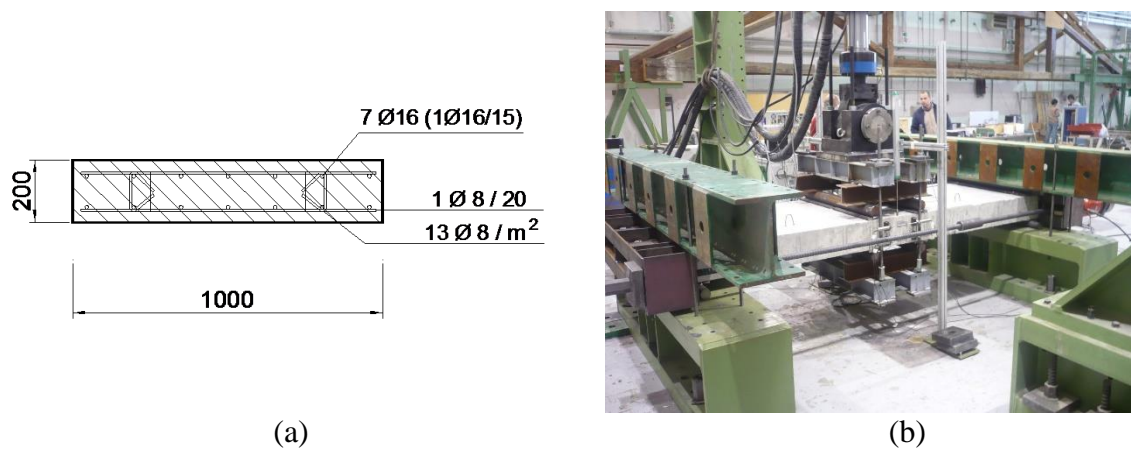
Test set-up on substructure: (a) cross-section specimen; (b) four-point loading set-up.
